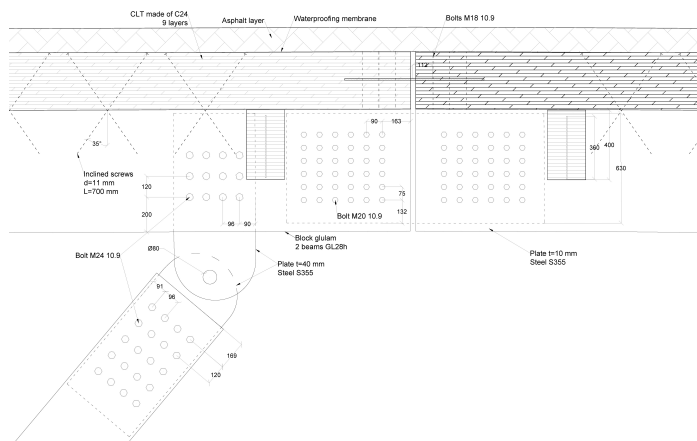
Section of connection strut to main girders. Also shows connection between main girders and deck
